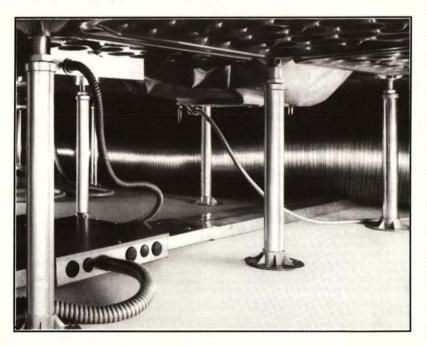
Pedestals supporting 600 mm x 600 mm floor panels (Cemac Access Floor system illustration)
